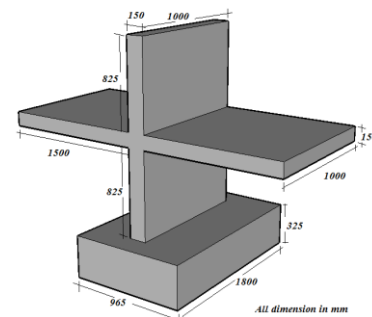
Schematic diagram of Interior Wall-slab joint design to British Standard
